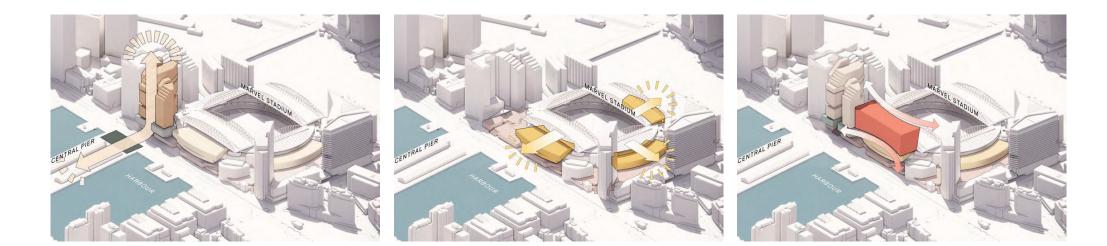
4 Towers positioned adjacent to Central Pier
